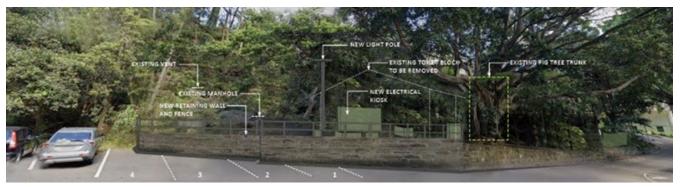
Site of proposed pump station in Parsley Bay Reserve, post works
